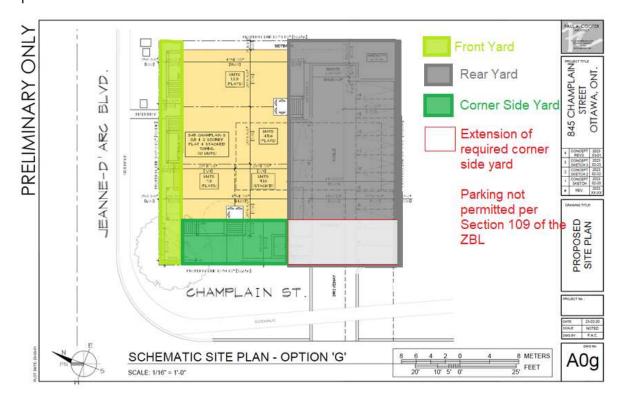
Sketch up of concept plan showing the front, corner, and rear yards, and the extension of the required corner side yard where parking is not permitted.
